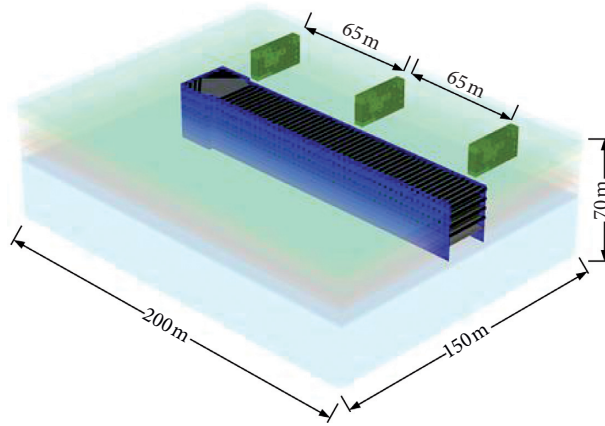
Three-dimensional numerical model of the longitudinal wall of buildings perpendicular to the foundation pit.
